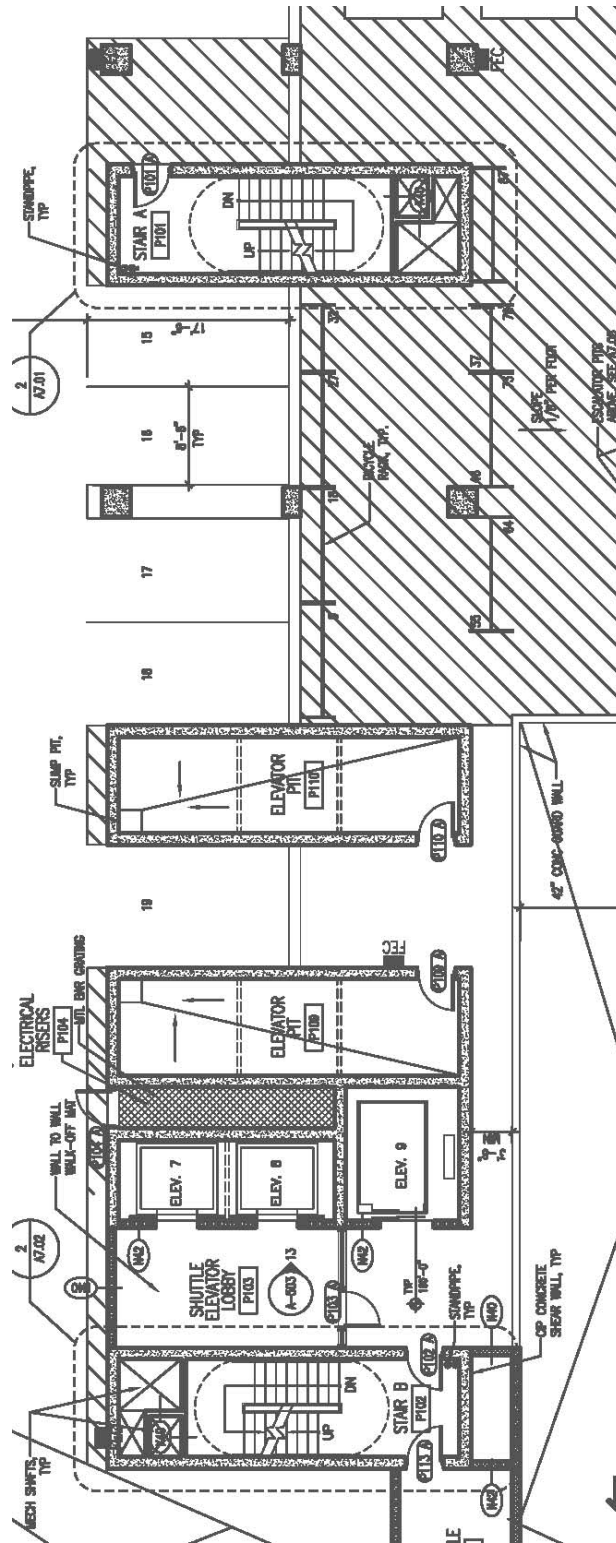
Original Parking Garage P1 Level Service Core Plan
